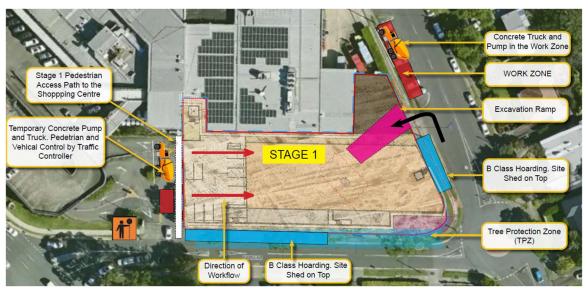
Work zone and Concrete Pumping arrangement (Stage 1)
